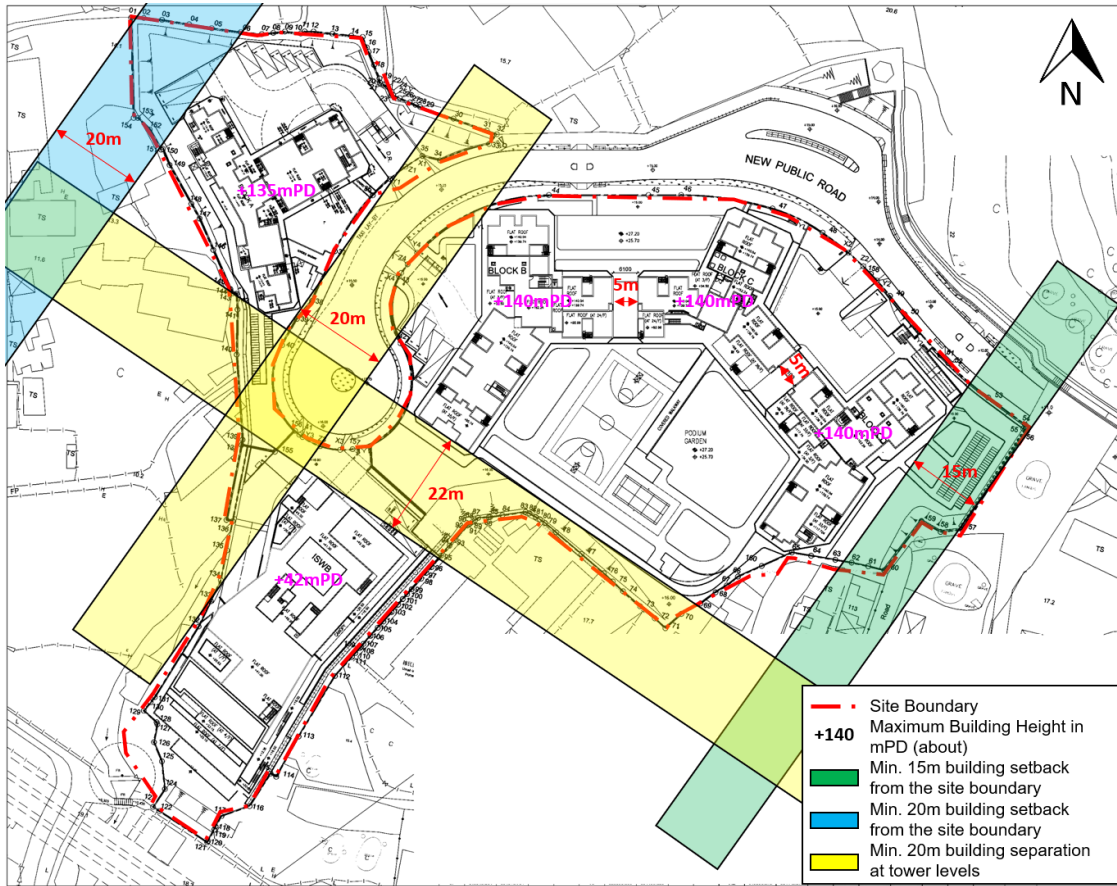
Layout Plan of Proposed Scheme at Site B (Master Layout)
